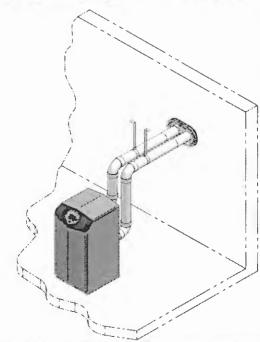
PVC/CPVC Two-Pipe Sidewall Termination - See page 21 for more details
